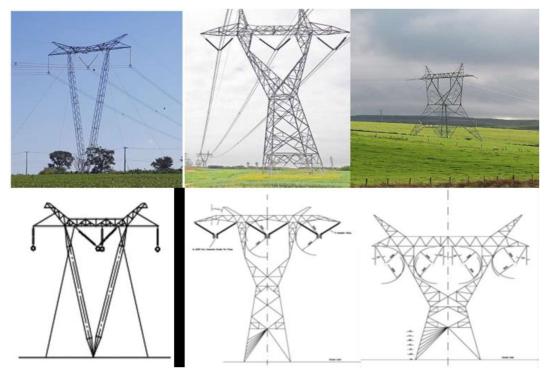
Typicals of towers used on OHL projects (from left to right Suspension V tower - Self supporting Y tower)
